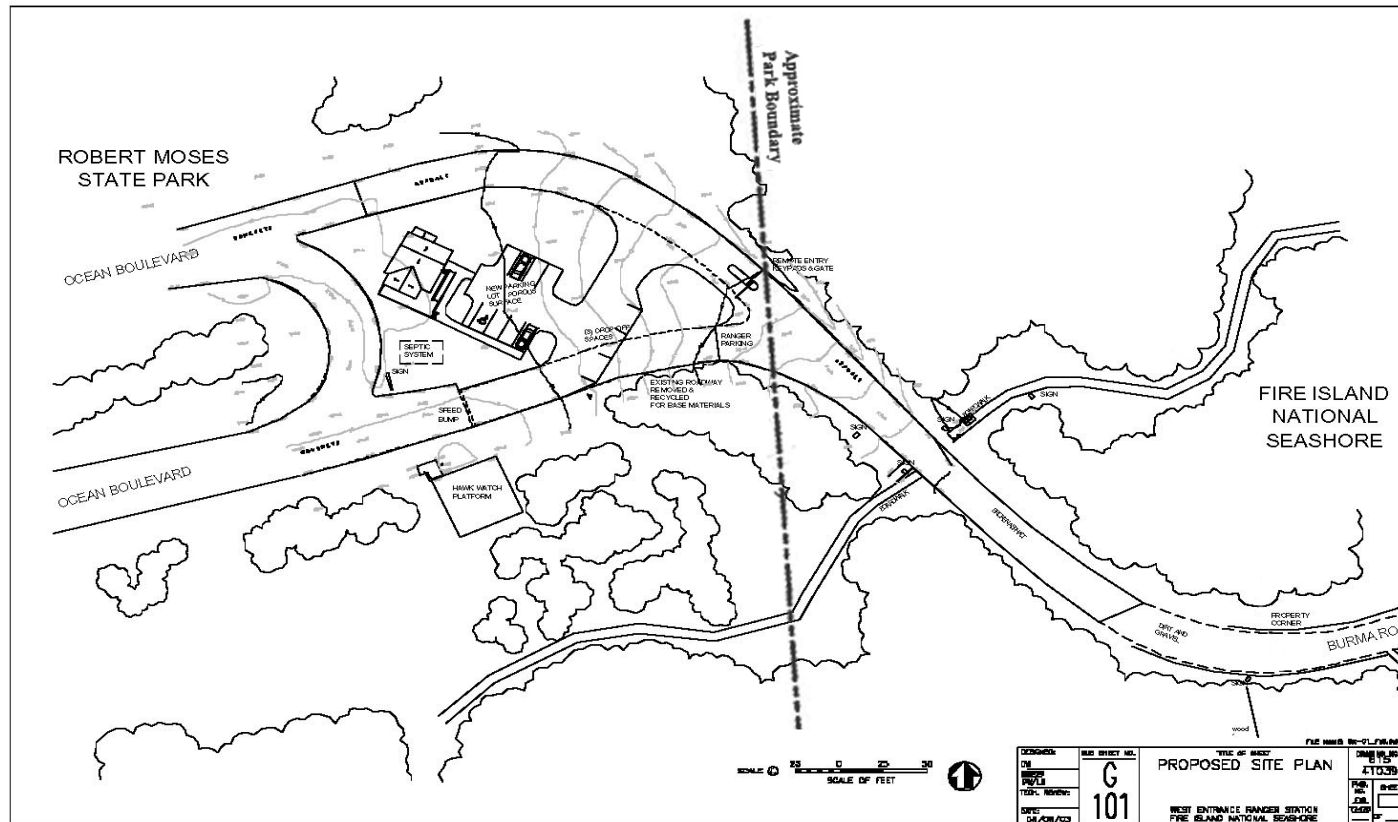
Alternative B Concept Plan– Preferred Alternative
